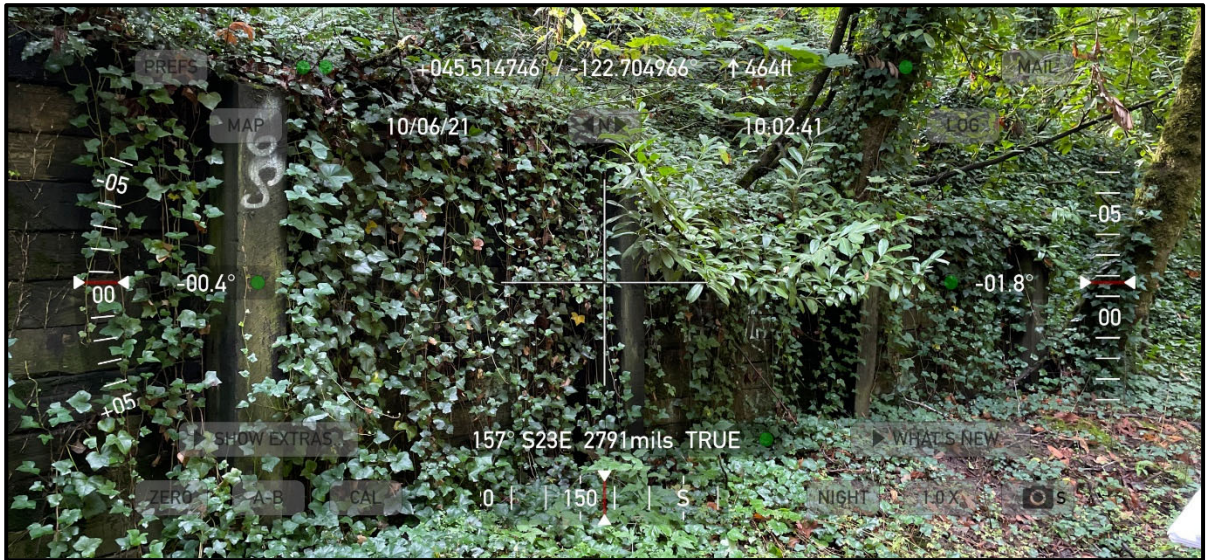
Timber Wall east of tracks near Culvert 14 looking southwest
